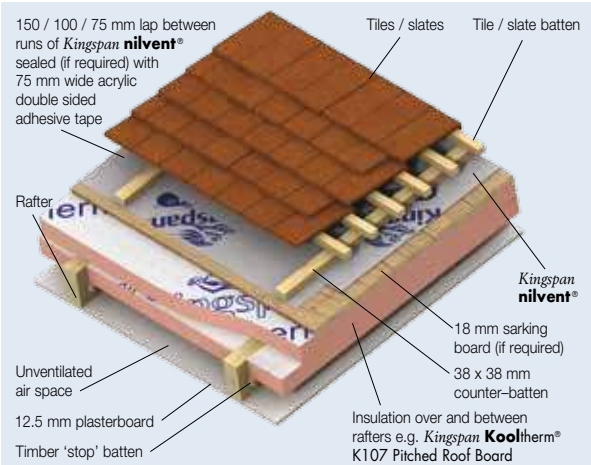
Insulation Over Rafters – Sarking Board / No Sarking Board – Battens & Tiles
